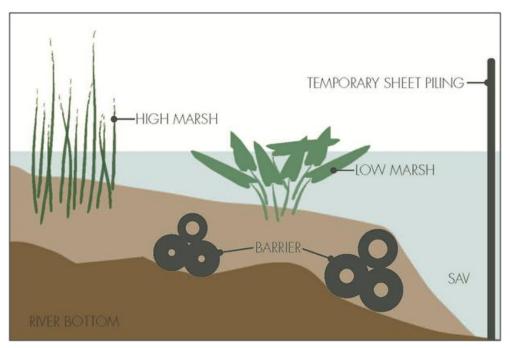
CONCEPTUAL ELEVATION DRAWING OF THE OUTER CONTAINMENT CELL TO ACHIEVE SOFT, NATURAL EDGES
